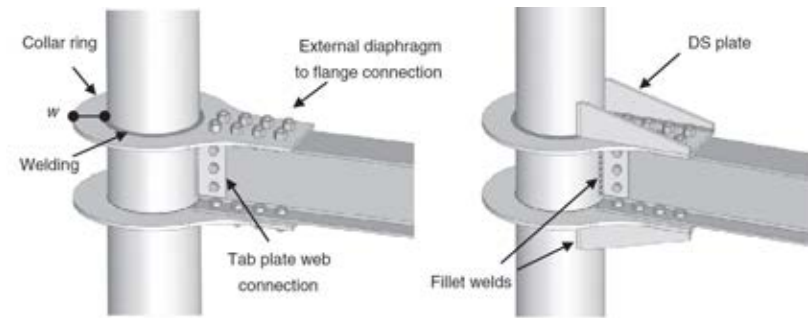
Beam-to-tubular column connections with collars (Sabbagh et al., 2013).
